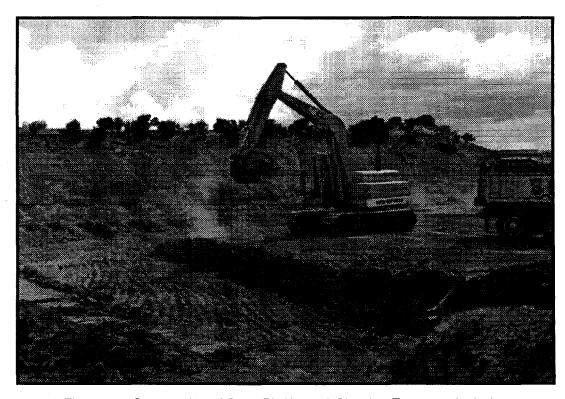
Construction of Sand Pit (Area 4) Showing Excavator in Action
